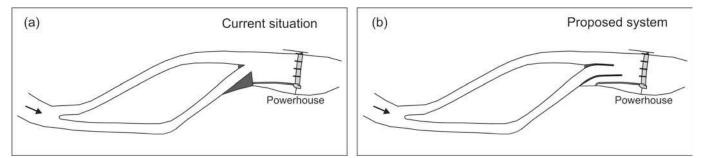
Current situation (a) and proposed system (b) of the sediment directing measures
